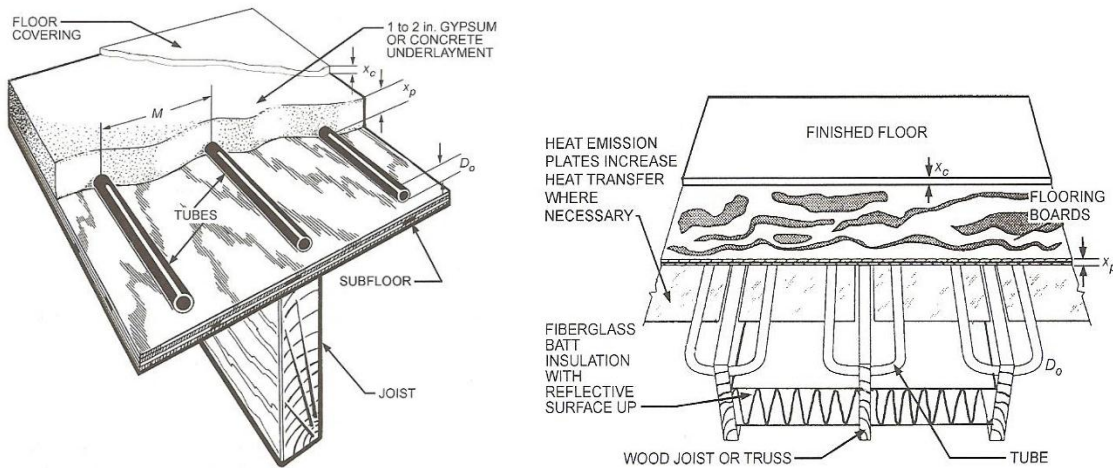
A typical embedded tubing in slab and tubing in subfloor (ASHRAE, 2008)
